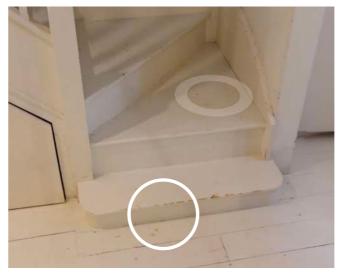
Lower Ground to Ground Staircase. First step is considerably shorter than subsequent steps suggesting that the level of the Lower Ground Floor is currently to high compared to original.
